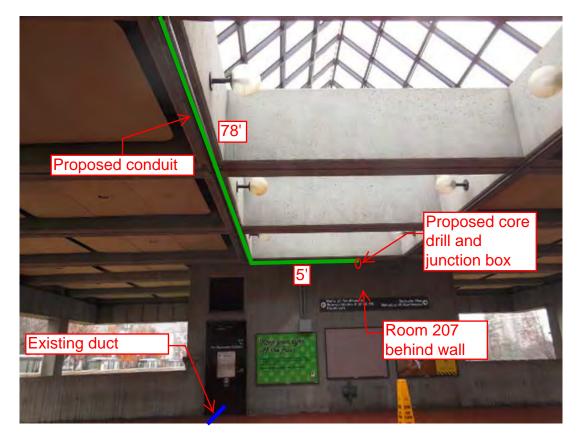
Existing and proposed conduits to AFC Panel in AC Switchboard Room 107
